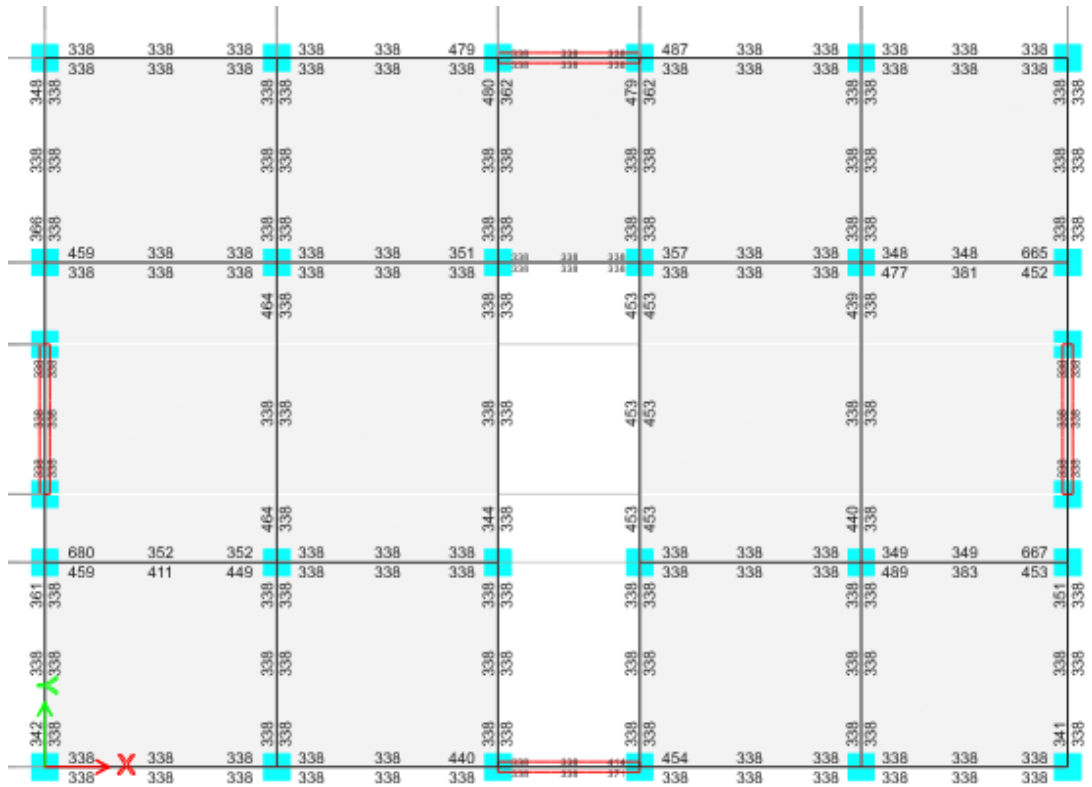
Cross-Sectional Area of Steel Bars in A Sample Floor Beams for LHRC Model (mm^2).
